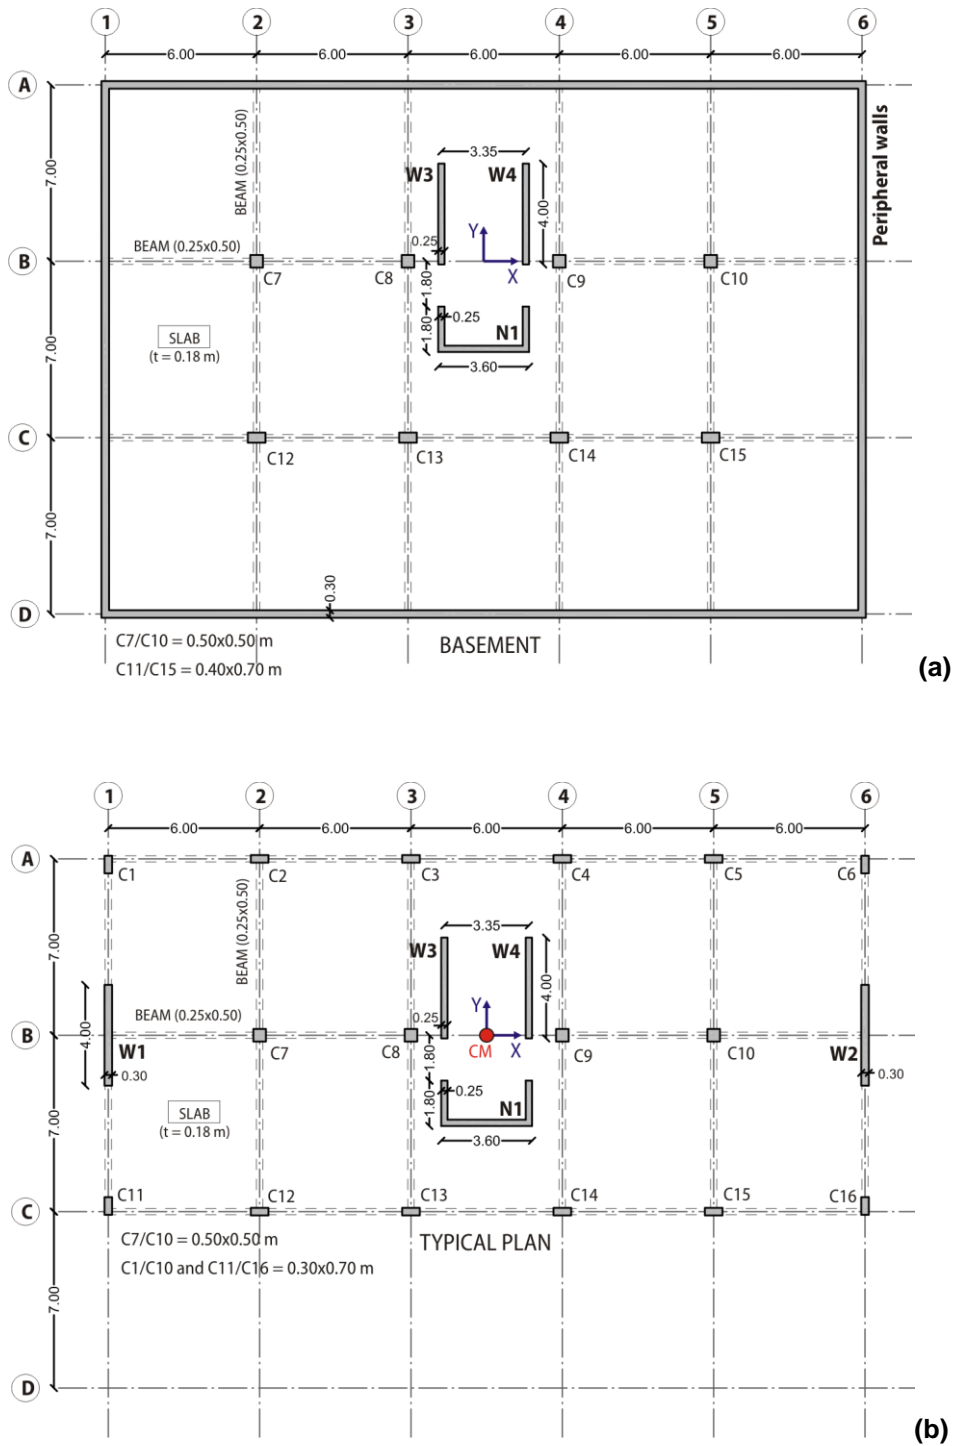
Floor plan of the building: (a) basement levels and (b) levels above 0. The X- and Y-axes as well as the origin of the global coordinate system and the centre of mass (CM) are marked
